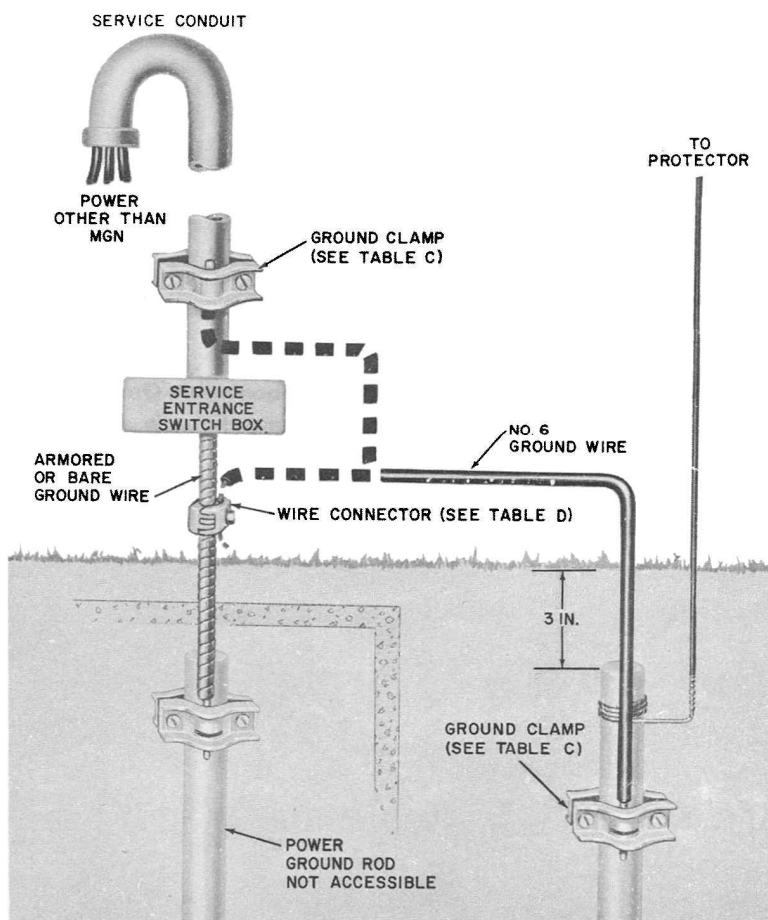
Power Other Than MGN Grounded to Inaccessible Ground Rod—No Water Pipe—Connection to Pipe Not Possible
